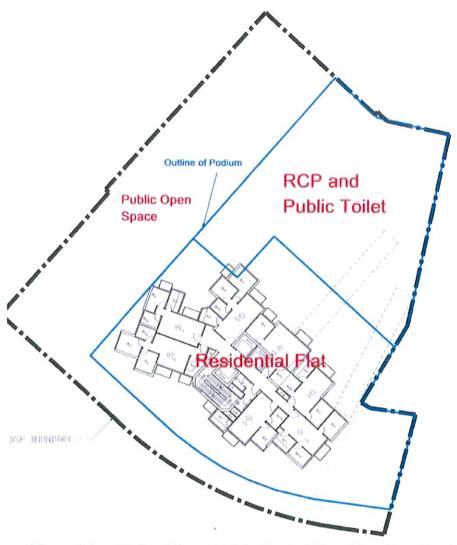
Notional Layout of the Typical Floor Plan (Low Zone)
